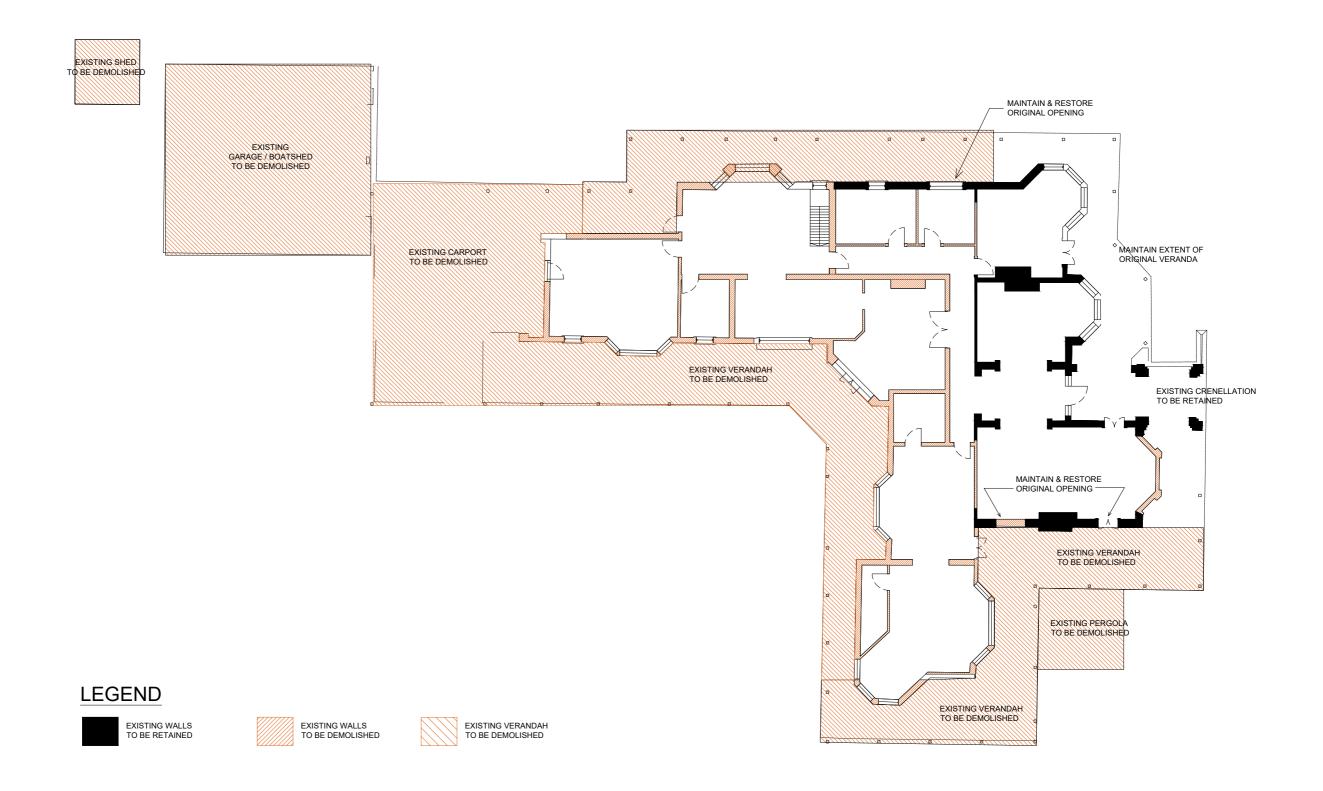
52 The Esplanade, Proposed Demolition Plan. (Source: Philippa Mowbray Architecture & Interiors, 2023)
